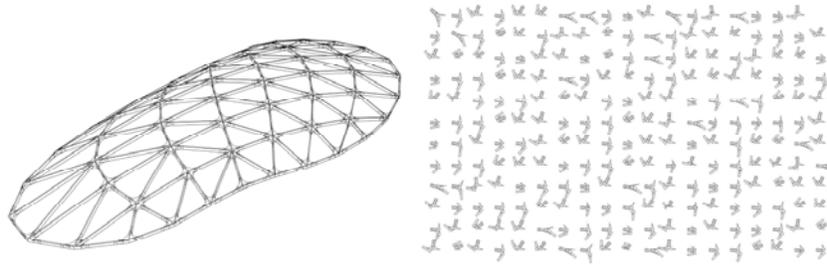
Sample grid shell with unfolded, 2D joints ready for CNC cutting.
